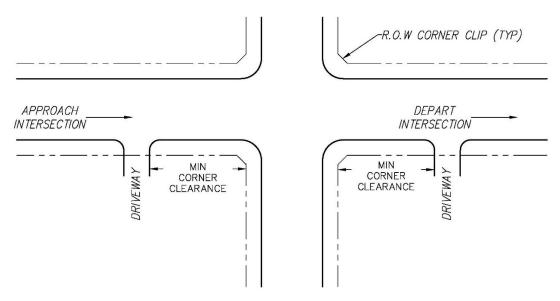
, Drive Approach Spacing at Intersections
